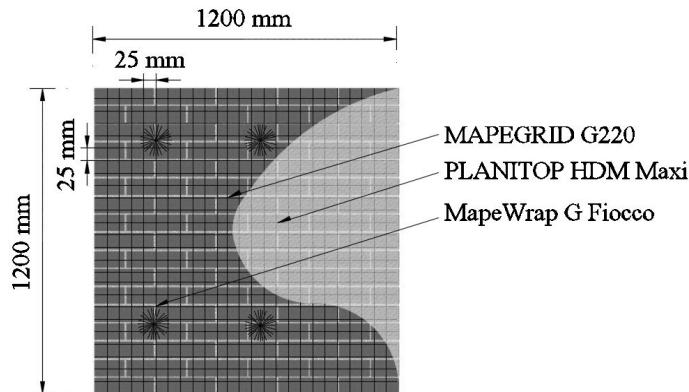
Geometrical configuration of the GFRP strengthened URM wall.
